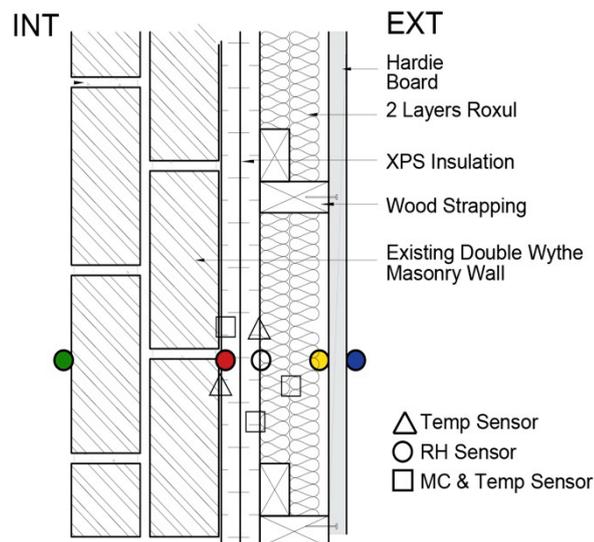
Sensor Diagram for Exterior Retrofit Wall 06 Test Hut
